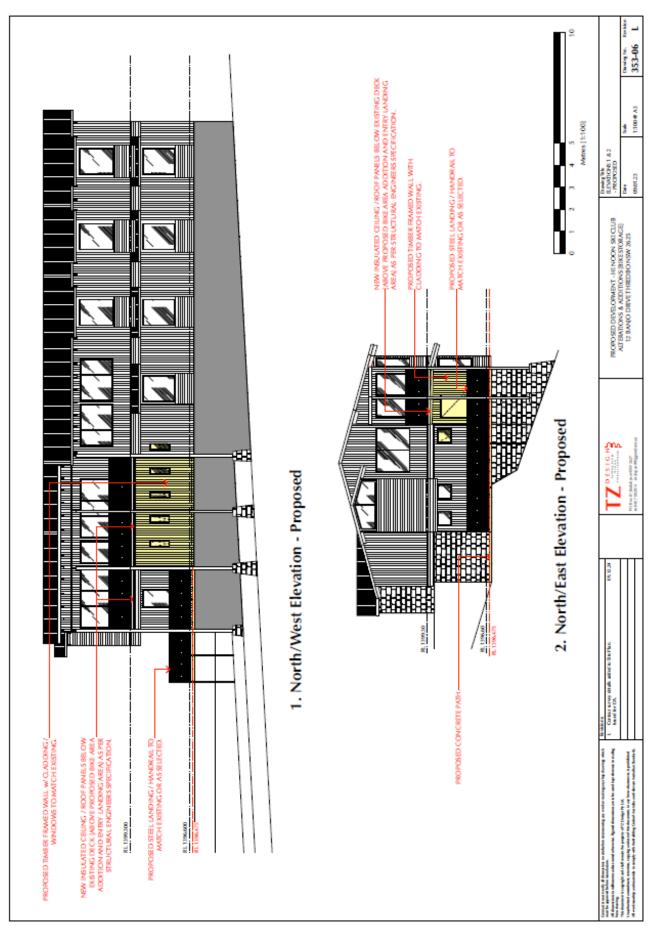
North/ West and North/ East Elevation - Proposed (Source: TZ Designs, January 2025)
